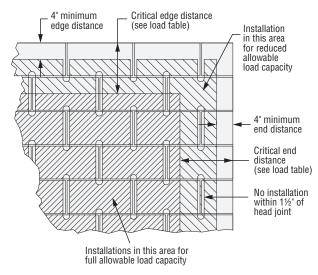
Allowable Anchor Locations for Full and Reduced Load Capacity When Installation Is in the Face of Fully Grouted CMU Masonry Wall Construction
